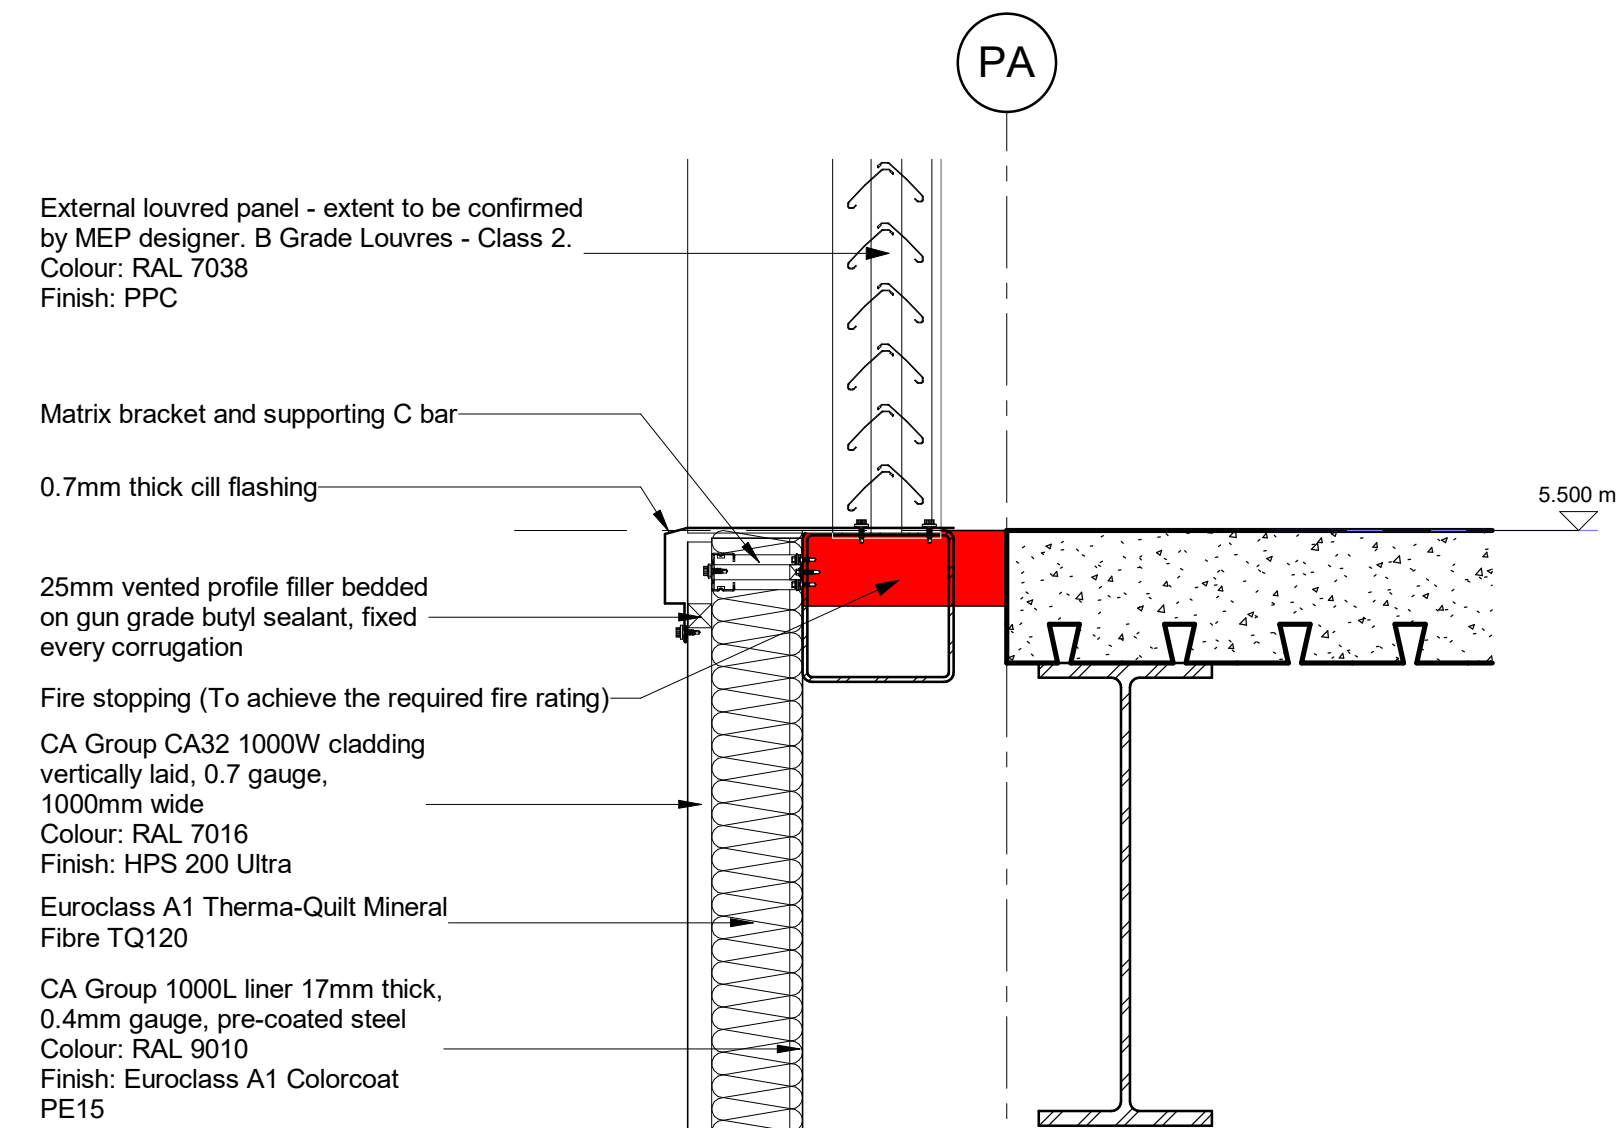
STRIP.DETAIL.PA.P02.01.04.Parapet/Lean-to Enclosure/Upstand
